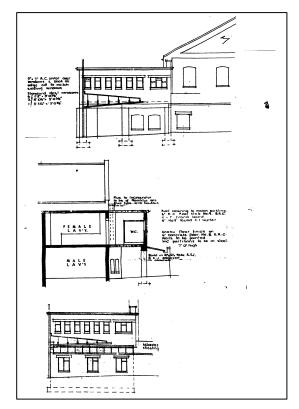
The new lavatories. top: west elevation with Building M to right. middle and bottom: north elevation showing the side elevation of Building M.²⁹
